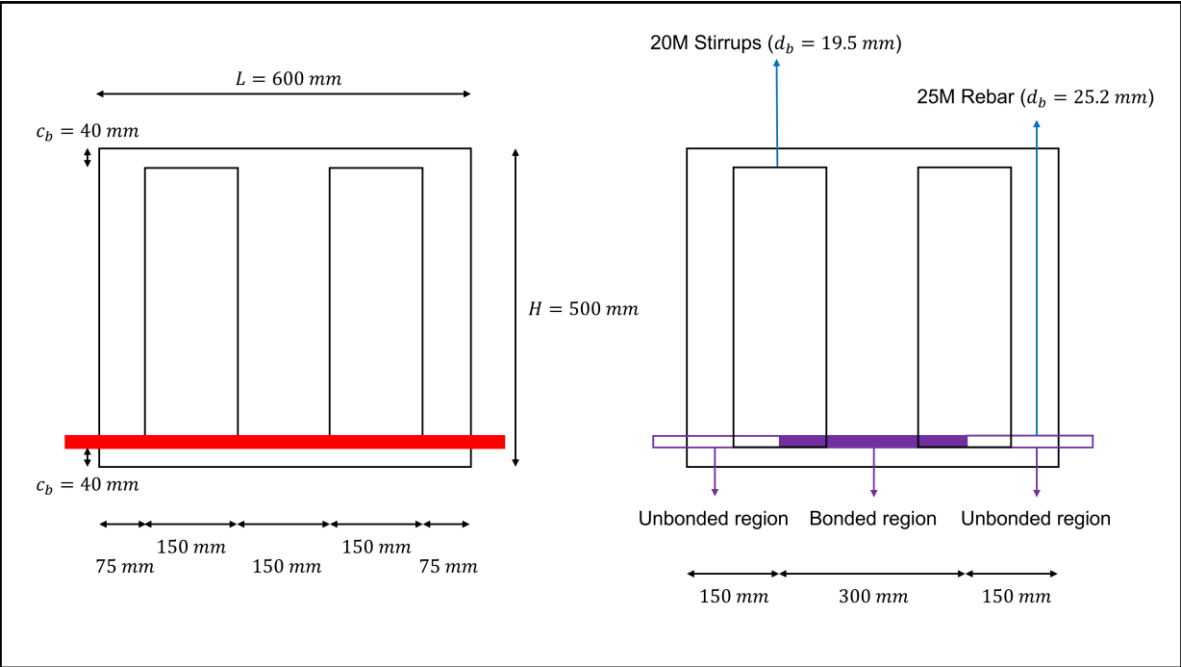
Bond RCA 25M Beam-end, 320 mm longitudinal view.
